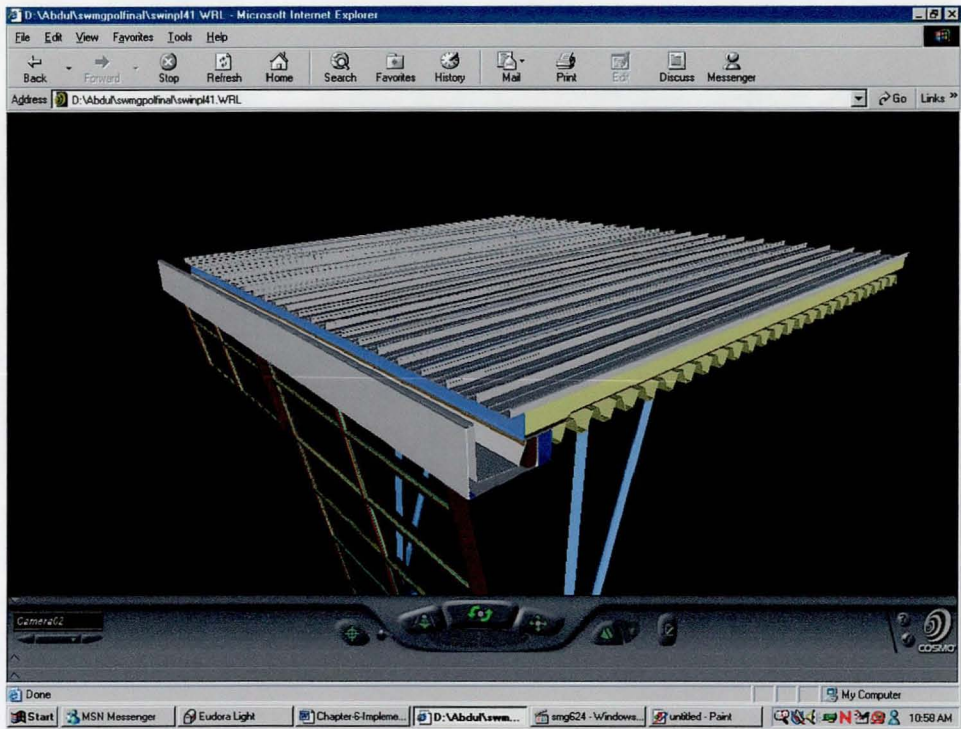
VRML model showing gutter, insulation layers, ceiling and roof interfaces in the swimming pool building
